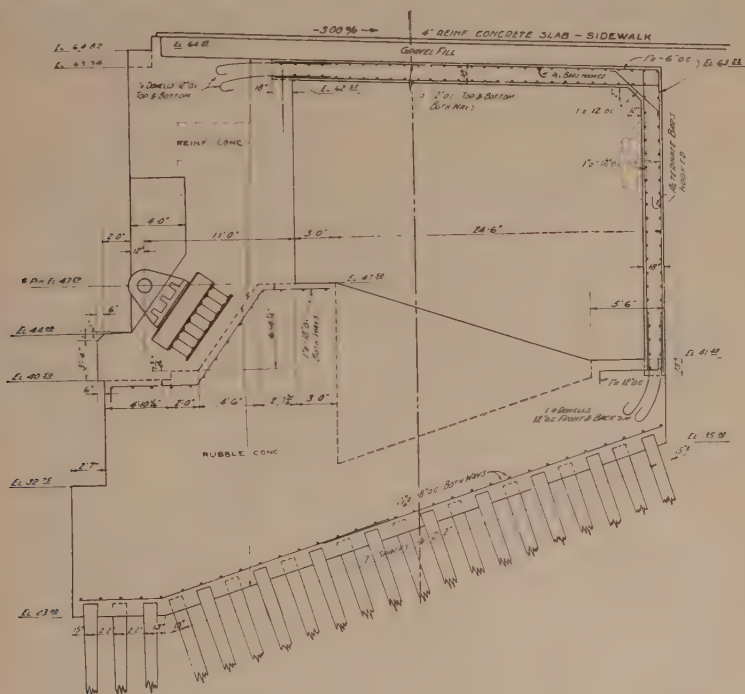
SECTION THROUGH EASTERLY PIER, SIDEWALK TRUSS
